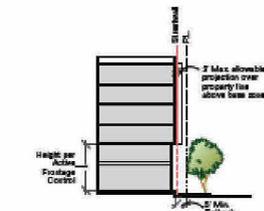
Type B, Typical Streetwall and Park Frontage Setback
